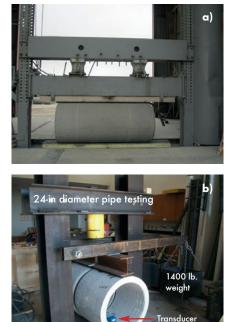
(a) Three-Edge Bearing Test or D-load test; (b) Long-term test setup. 24-in diameter pipe testing with 1400 lb weight. Transducer placed inside the pipe
